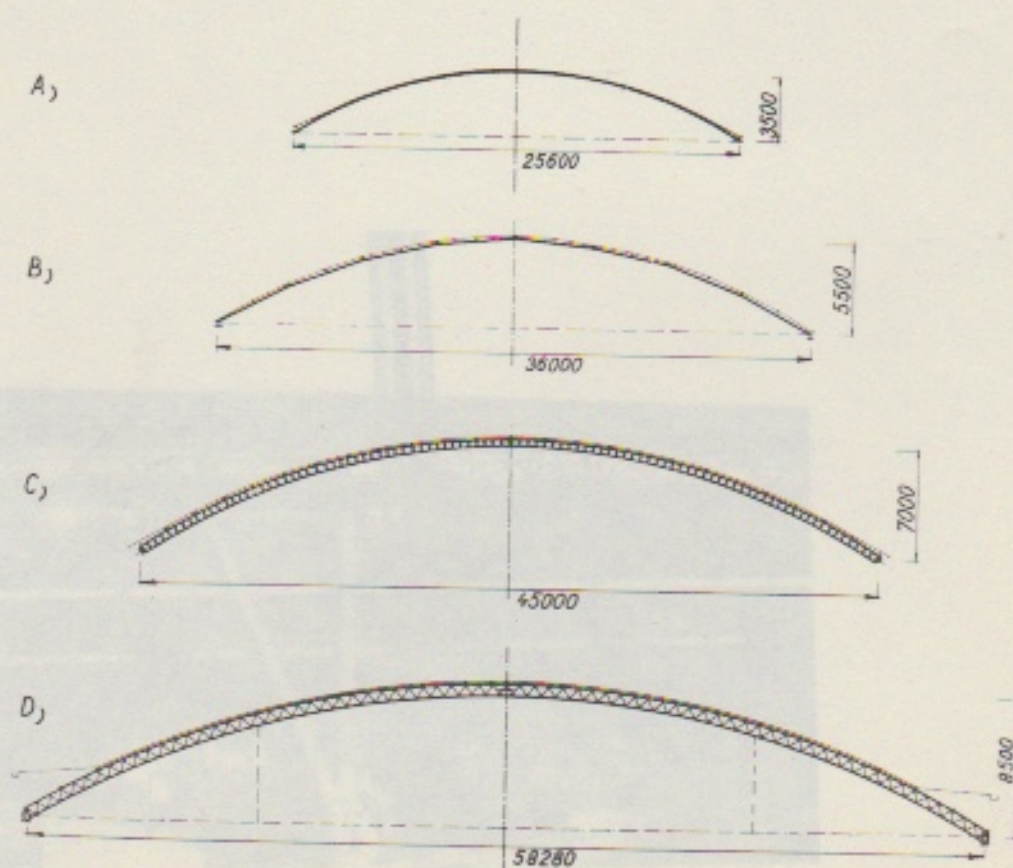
Cross-sections for typical 'single-' and 'double-layer' lamella barrel vaults.
